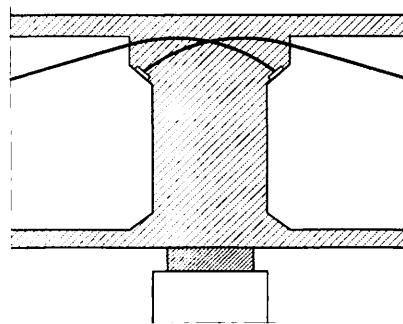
Anchoring of prestressed cables at blisters in a box girder
